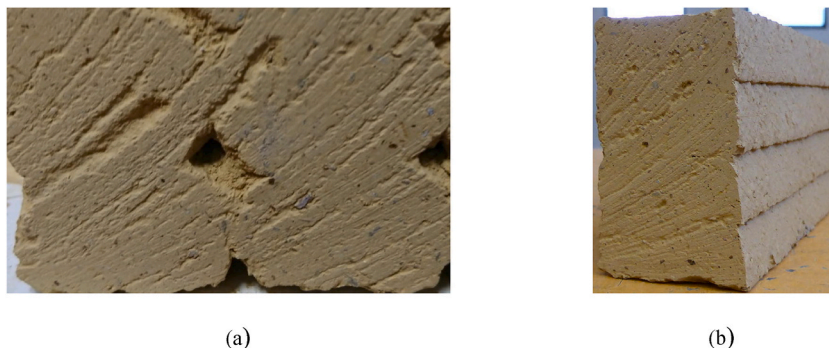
Cut section of printed samples of earth: (a) printed with circular nozzle and (b) printed with rectangular nozzle [39].
